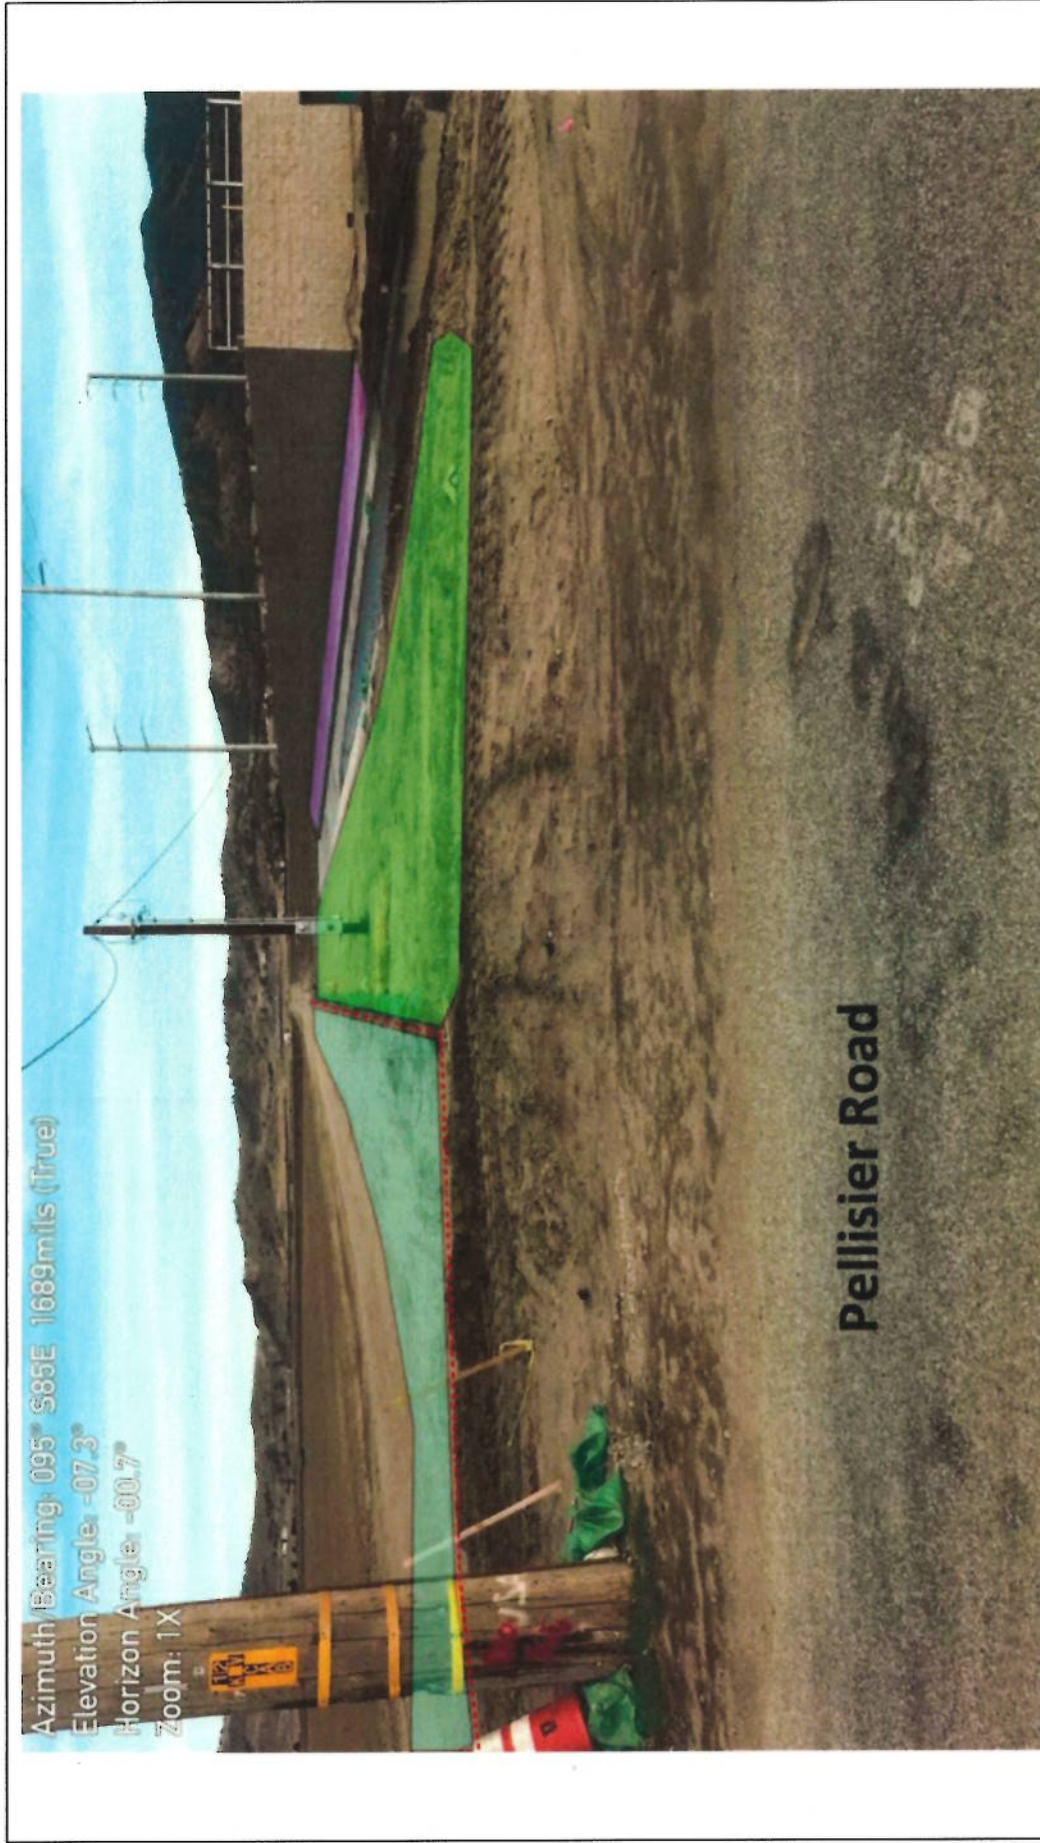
View east of the proposed expanded LOD and designated landscaping area along the northern boundary of Substation site.
